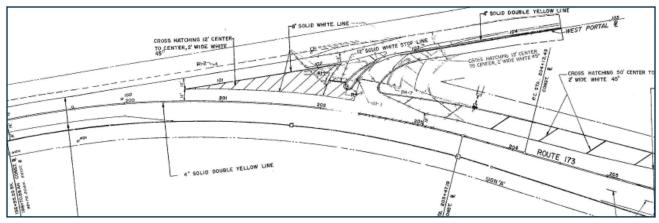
Striping pattern for Route 173 and West Portal Road intersection.
